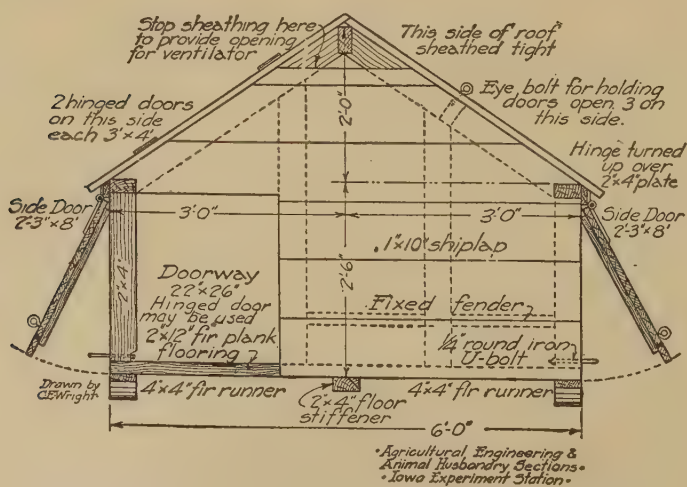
FRONT END VIEW OF IOWA GABLE-ROOF HOUSE
